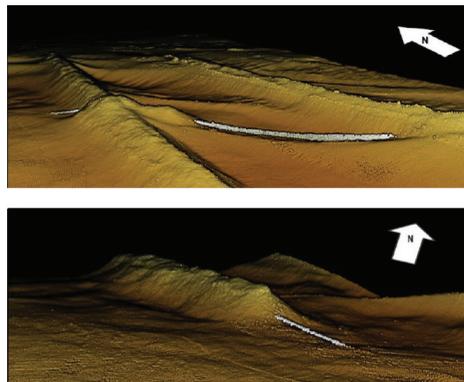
Scour at cable crossing rock berms resulting in fixed free span cable exposure. Two 250 m long rock berms 40 m apart. Morecambe Bay, UK.
